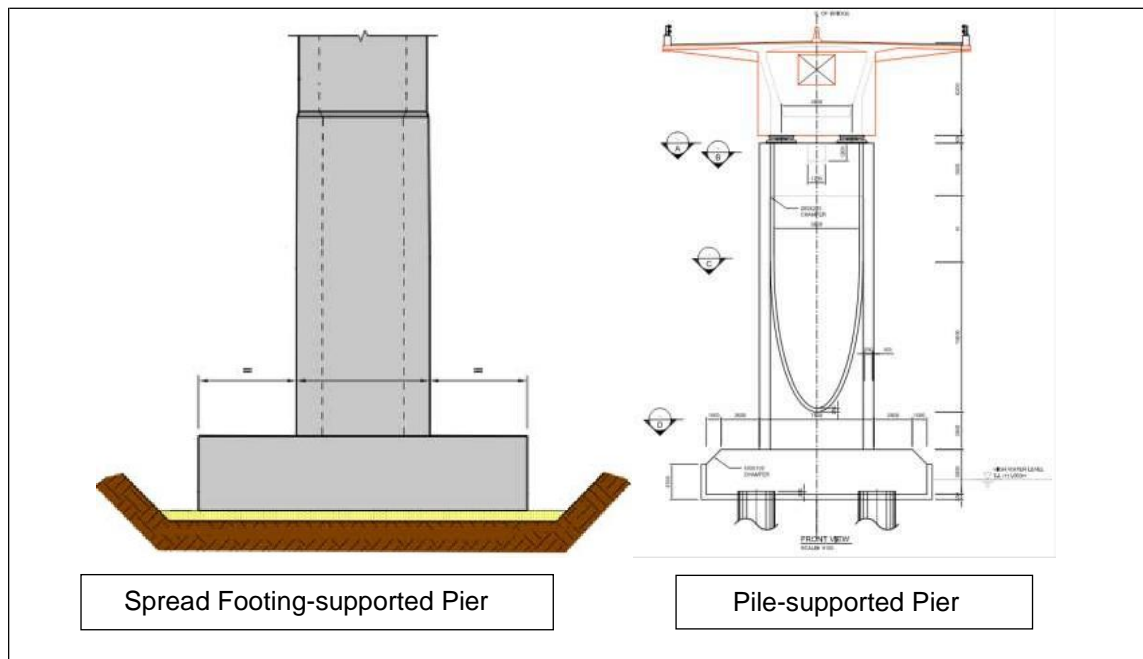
Comparison View of Spread Footing Supported Pier and Pile-Supported Pier
